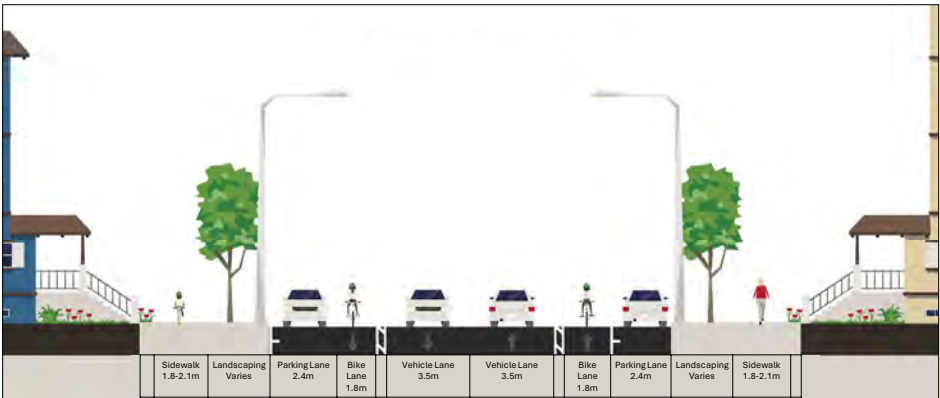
Collector Road 'B', 'C' & E (26.0m) Cross Section
